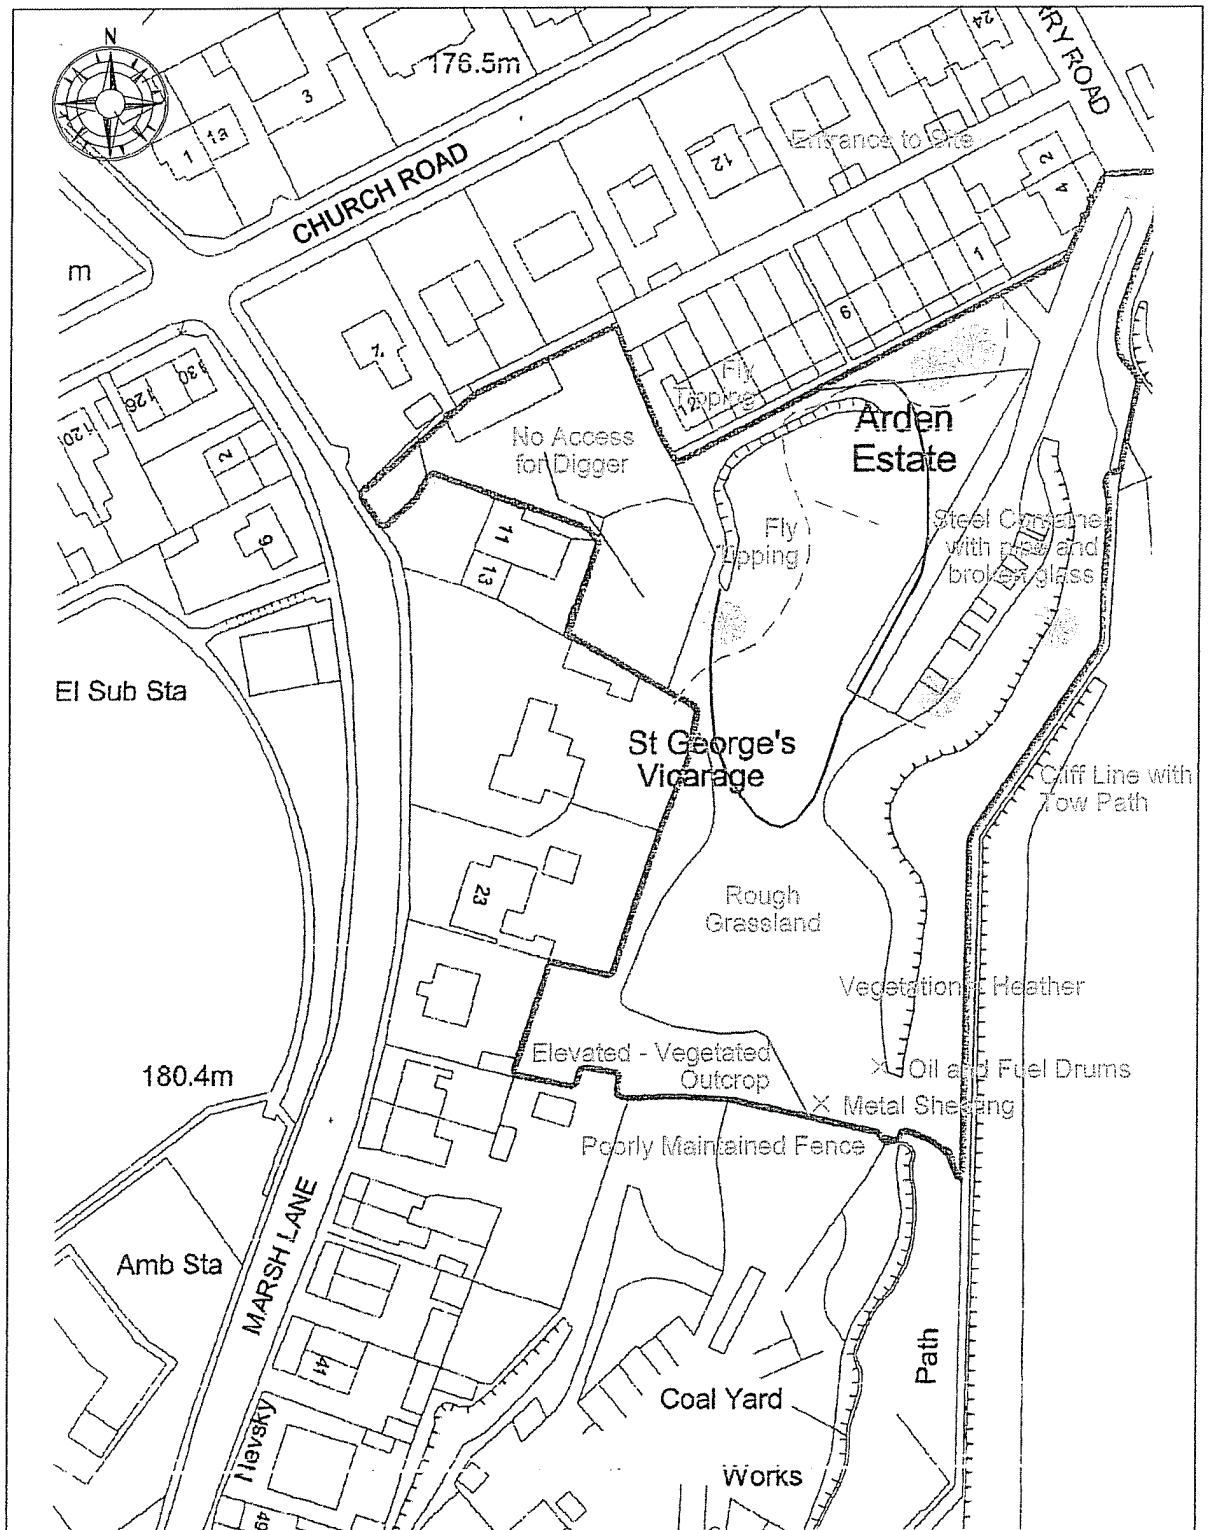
SITE PLAN WITH OBSERVATIONS FROM SITE WALKOVER
